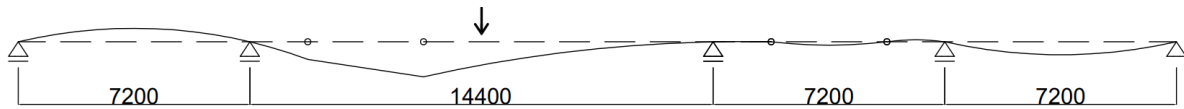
Interior or facade column removed, Gerber beams supported by hinged connections
